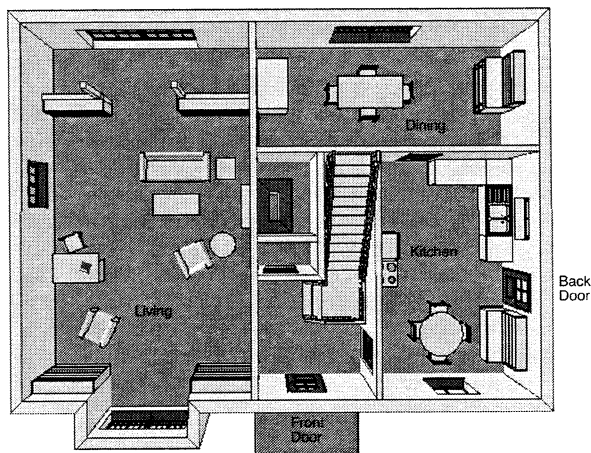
The Cleaver house, plan of main floor (not to scale).
